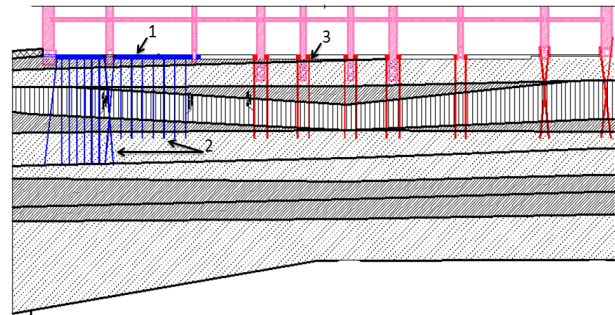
Arrangement of elements for strengthening the soil foundation and existing foundation: 1 – new foundation (reinforced concrete raft); 2 – reinforcing elements in the soil; 3 – reinforcing elements of existing rubble foundations.
